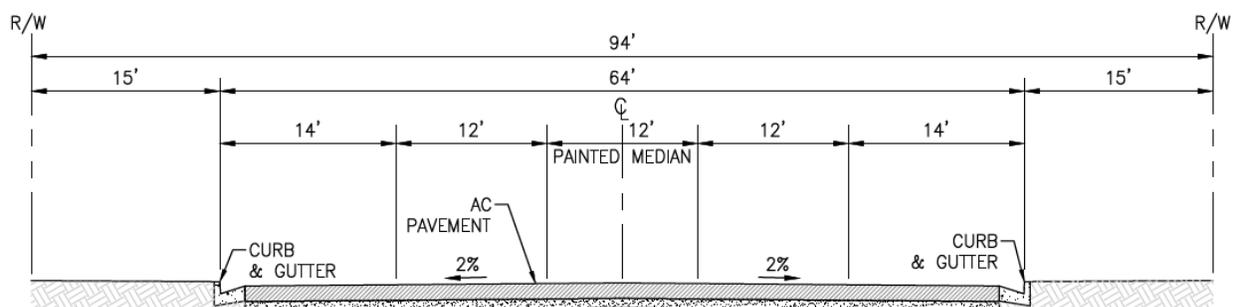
Western Way Typical Cross Section (Ultimate)
